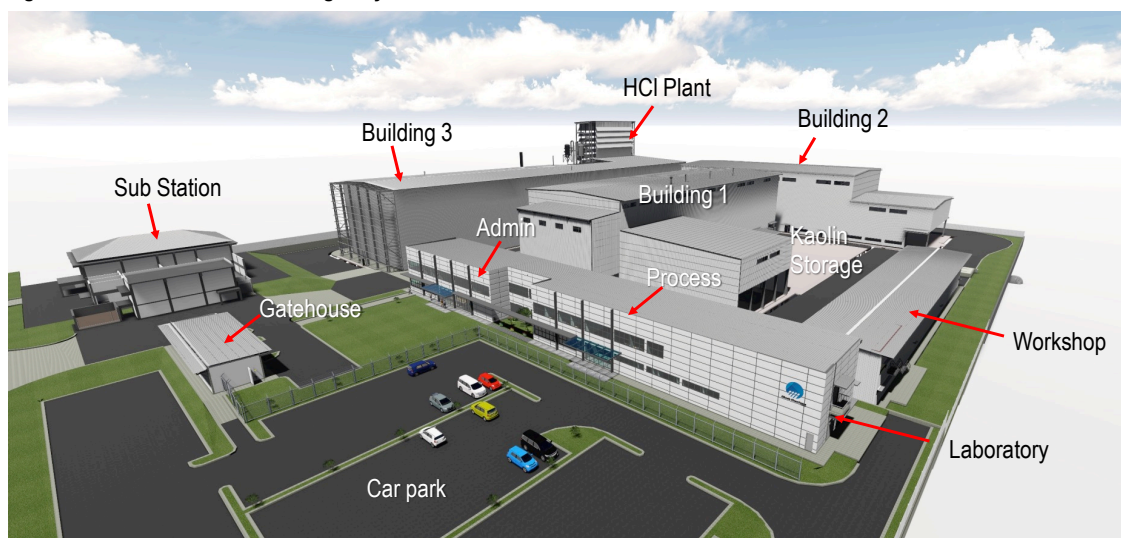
HPA Plant Site Final Buildings Layout (2D Drawing)
